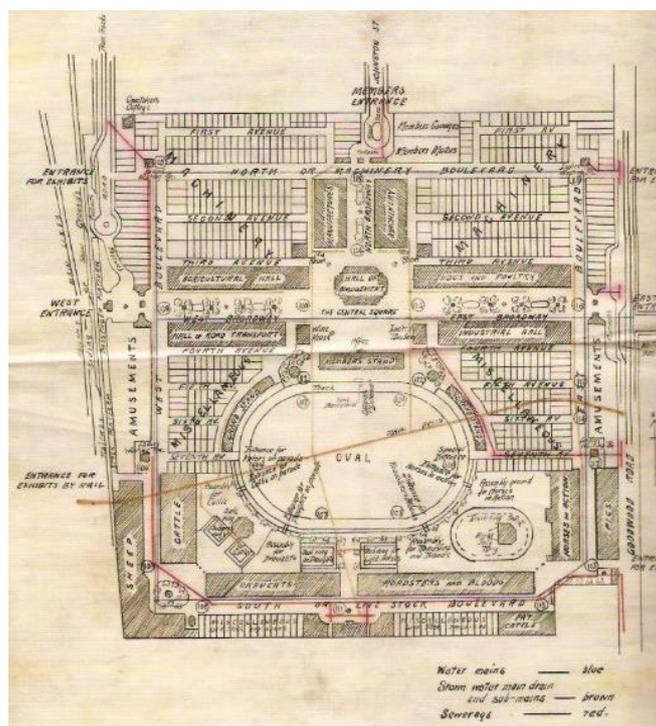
Plan showing Heath's Layout for the Wayville Showground
